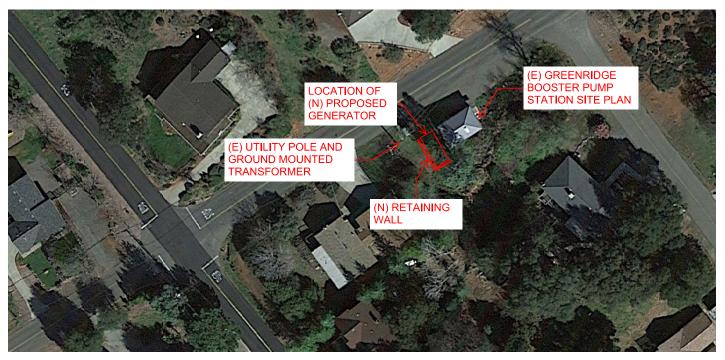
Proposed Site Plan of Greenridge Booster Pump Station Site
